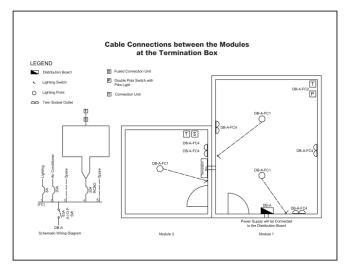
Typical Diagram of Cable Connections between the Modules at the Termination Box
